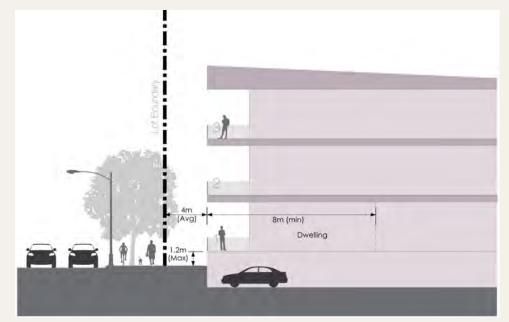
RESIDENTIAL 1 R-AC0 BASEMENT PARKING - NIL SETBACKS TO STREET BOUNDARY (APPROPRIATE SCREENING SHALL BE PROVIDED TO CAR PARKS)
